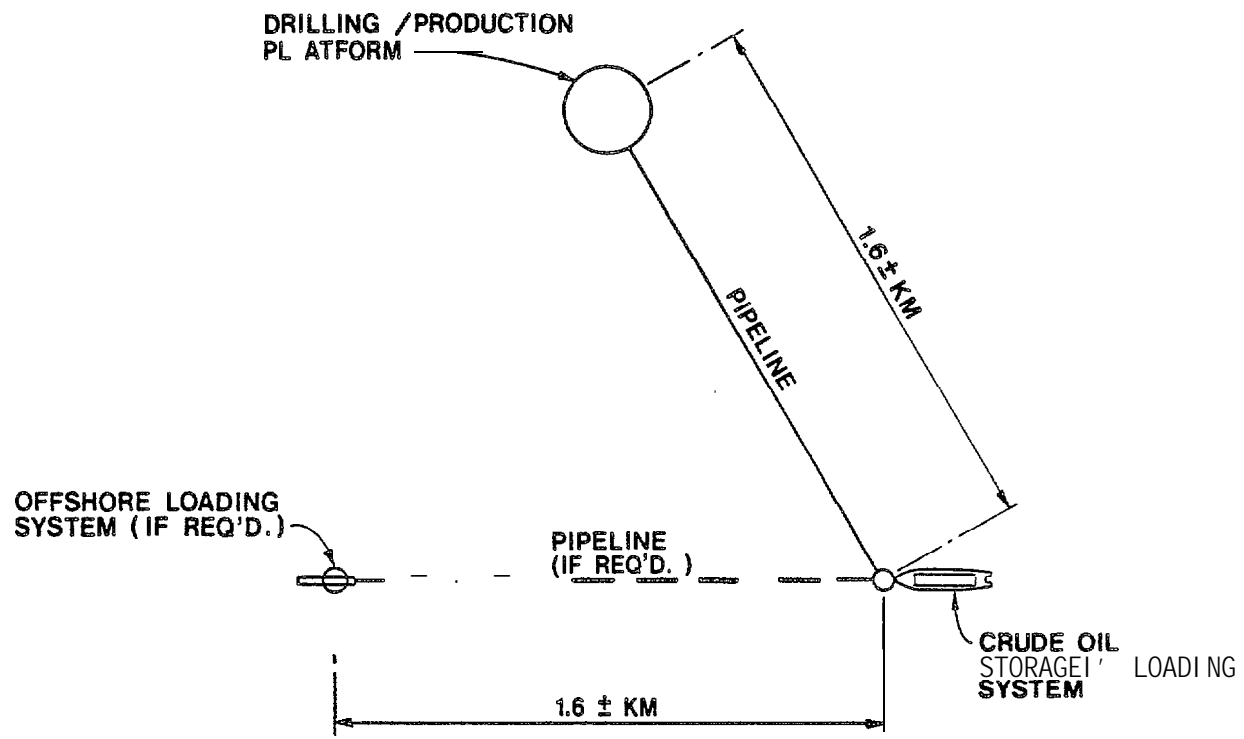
Scenario 2 schematic layout of offshore loading terminal.
